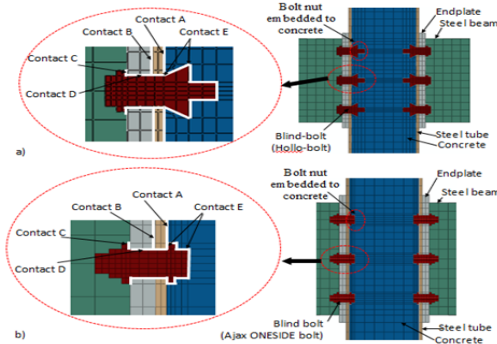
Contact details for steel beam-CFST column joints with: a) blind-bolted (Hollo-bolt) endplate connection, b) Ajax ONESIDE or normal bolted endplate connection
